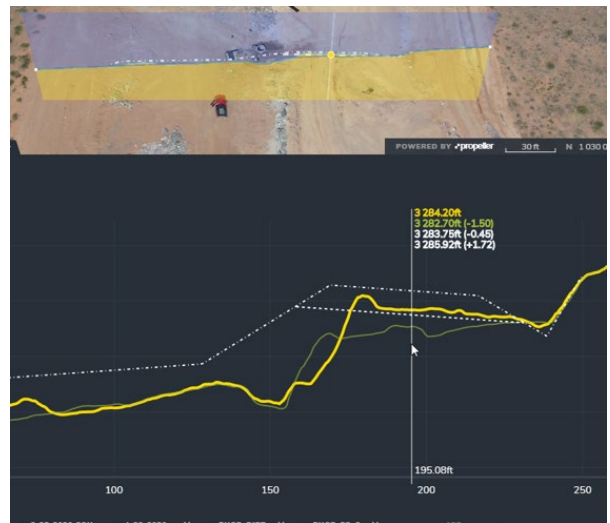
Construction phase cross-section views (Image courtesy of Utah DOT)
